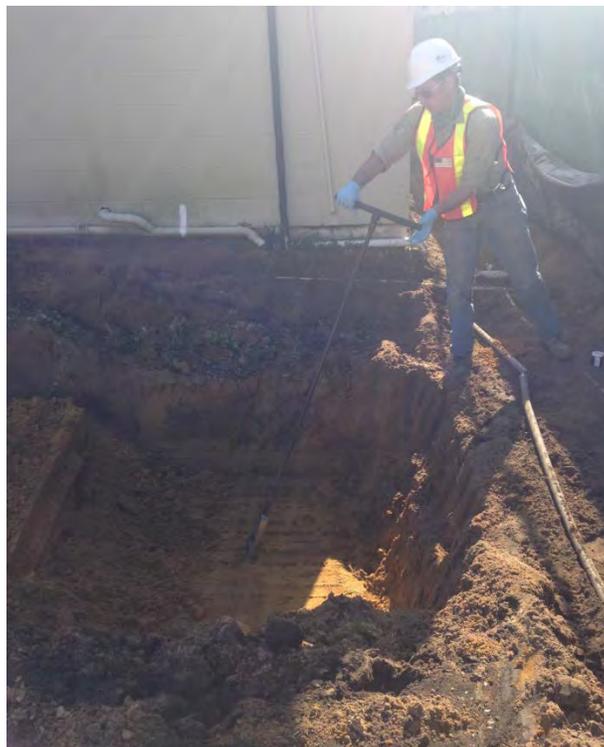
Collection of post excavation soil sample B14/15-SW-02, adjacent to Building 14.
